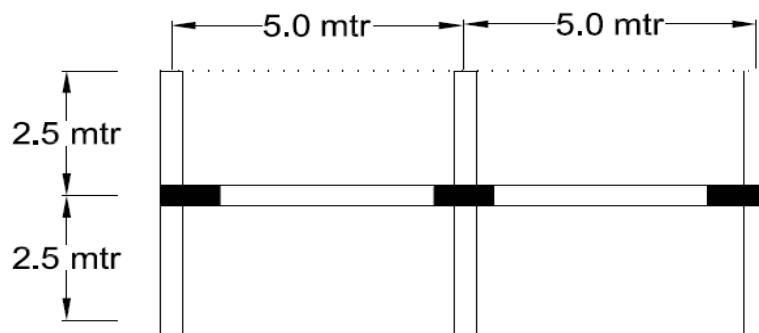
(b) Plan showing the columns and beams at floor levels of the plane frame.
